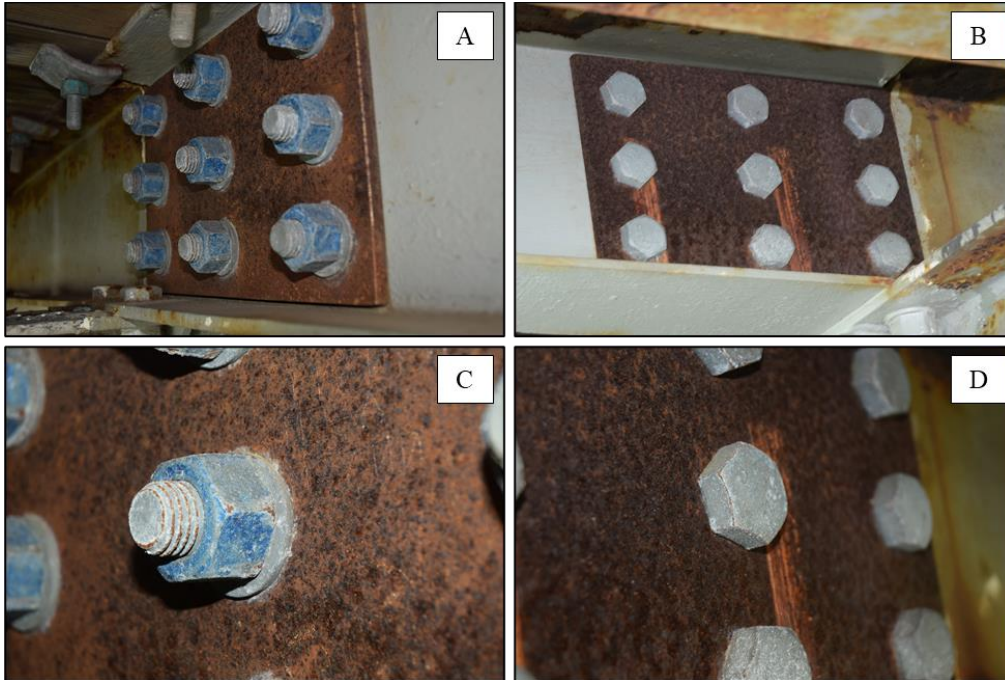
Photographs of Bolted Repair Type 4 Made of 50CR Steel and A588 Steel Plates With A325 Galvanized Fastener Assemblies on the Onancock Bridge: (A) general view of 50CR steel plate; (B) general view of A588 steel plate; (C) close-up of fastener assembly on 50CR steel plate; (D) close-up of fastener assembly on A588 steel plate.
